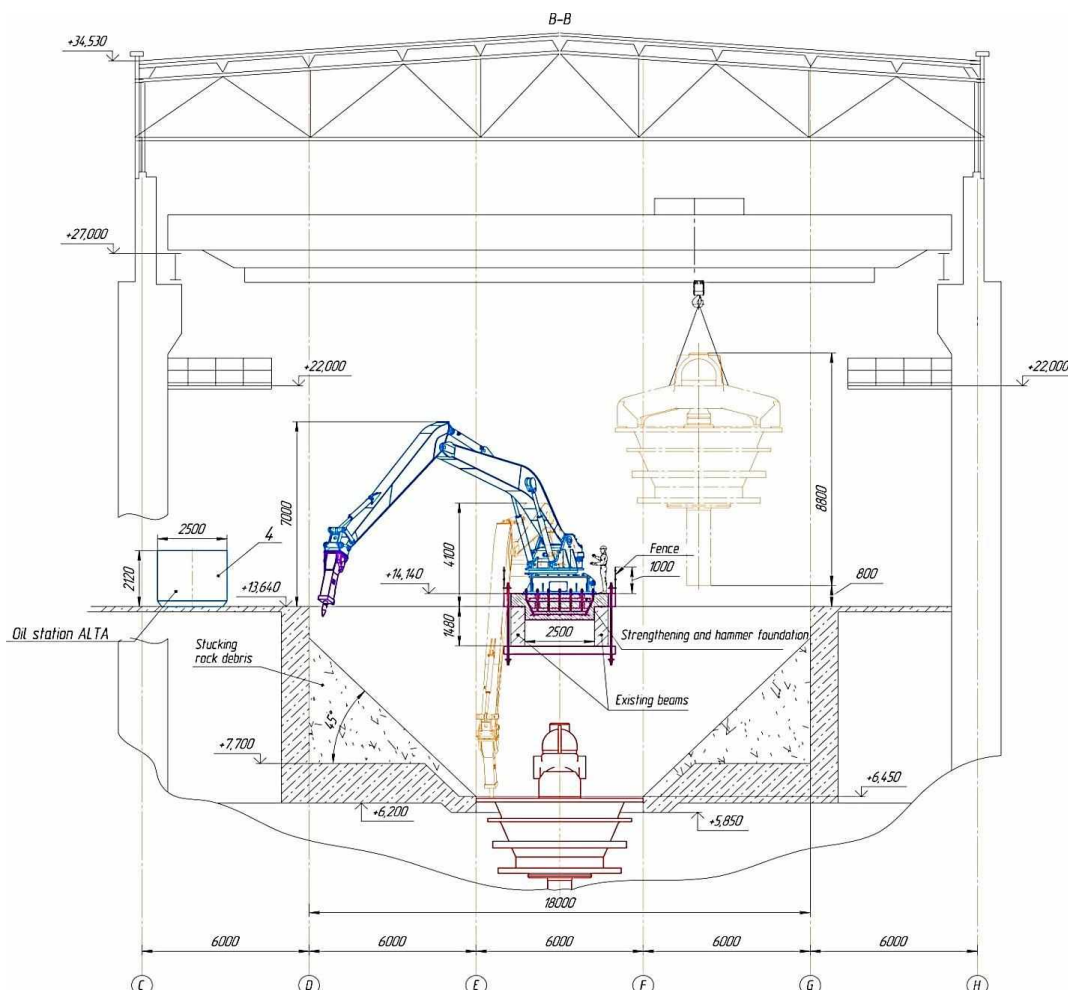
The plan for the installation of the hammer GR-158 at the mark +13,640. Cross section B-B of fig. 5
